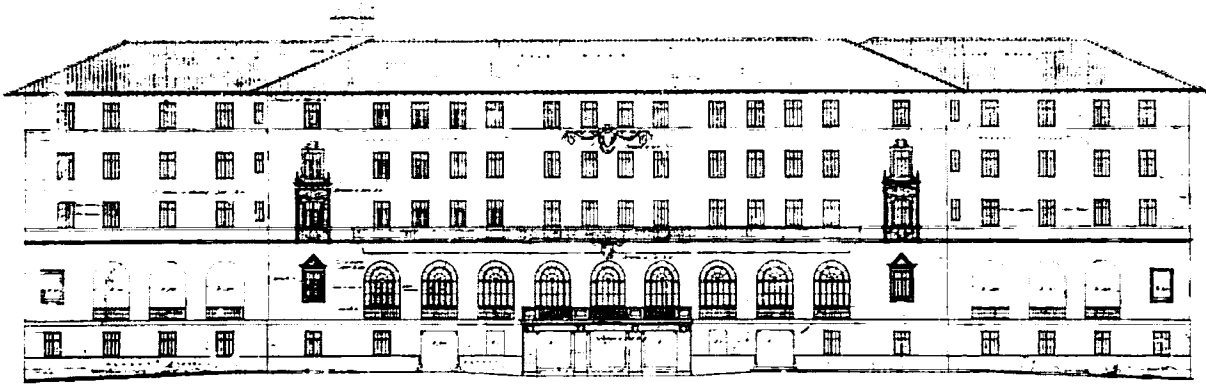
Hotel Condado Vanderbilt, principal elevation. Warren and Wetmore Architects.
